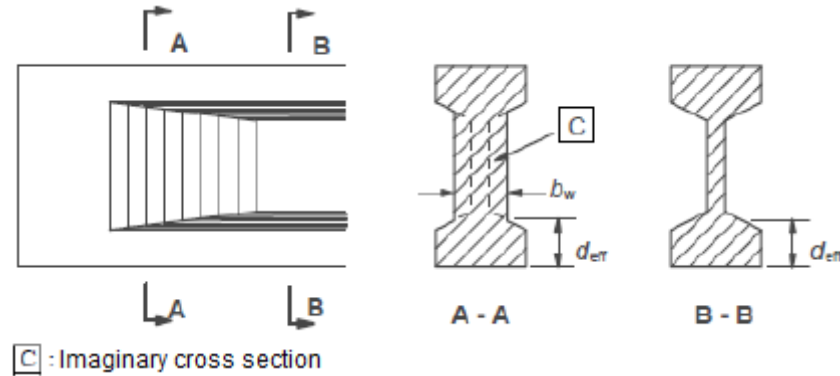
"I" beam with variable b_w web width meeting the requirements of an imaginary cross section
